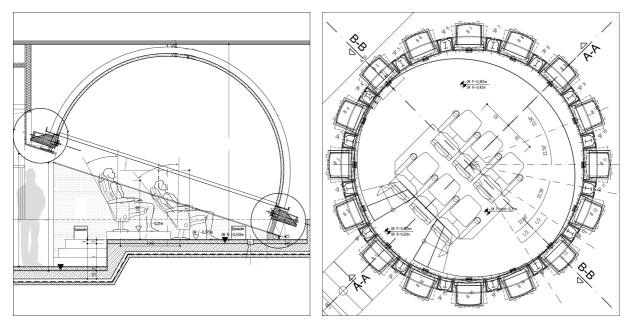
The cross section (left) and floor plan (right) of our 3D stereoscopic dome. The floor plan also shows the projectors ("B1–B16") and the speakers ("SP1–SP16") in-between.
